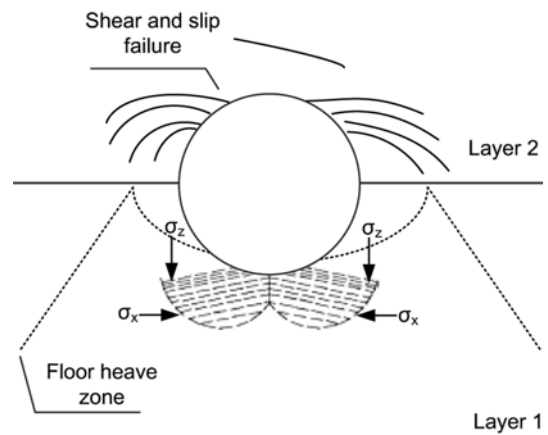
Failure Behavior of a Tunnel Excavated in Mixed Strata
